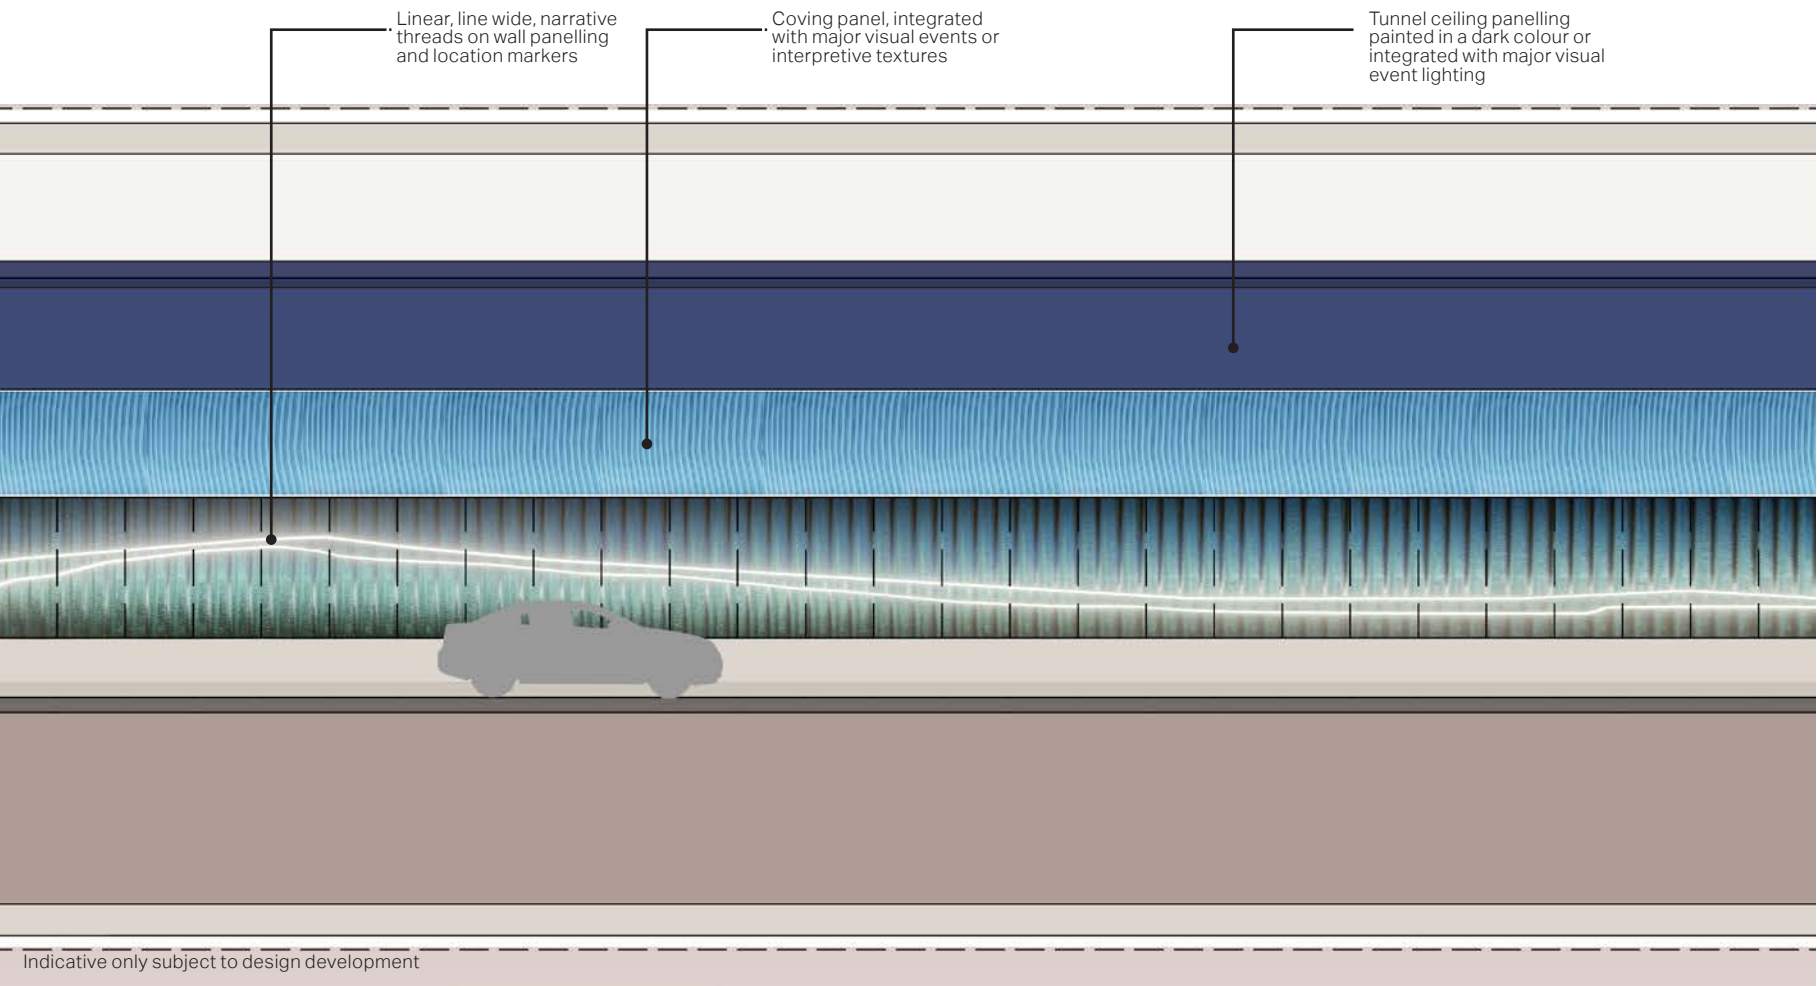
Long cross section demonstrating tunnel experience (tunnel interior to be developed further through consultation)
